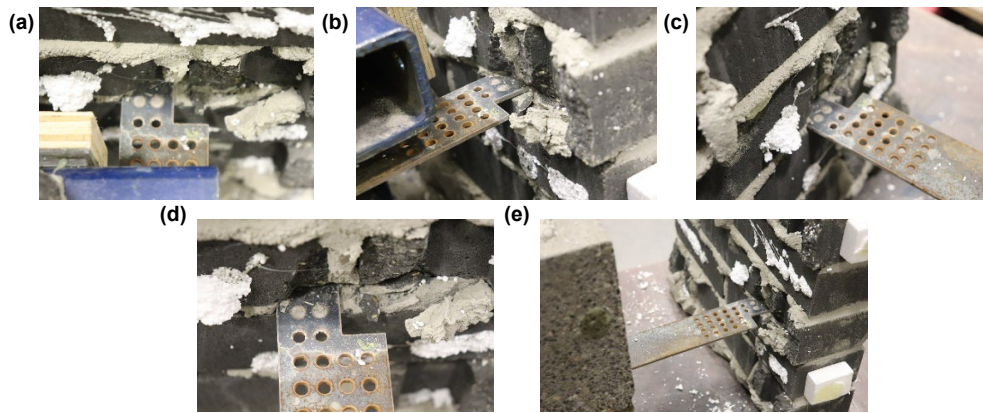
T-PH.CN-3 after testing of (a) top view, (b) elevated side view, (c) alternative elevated side view, (d) connector condition after testing, (e) zoomed out view of elevated side view
